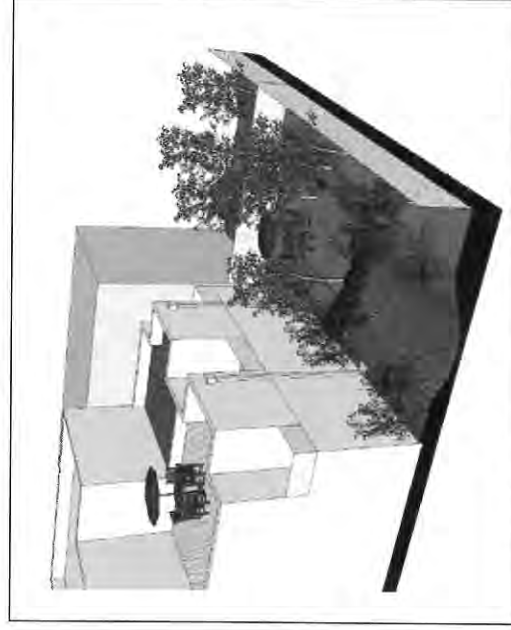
Minimize stormwater runoff to impermeable areas with landscaping, green roofs, and rain gardens when possible.
